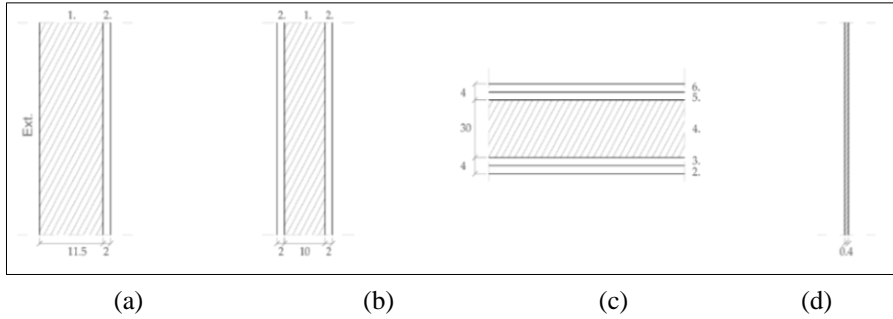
Current constructive composition of the dwellings: (a) façade constructive section; (b) inner division section; (c) slab section; (d) glazing section.
